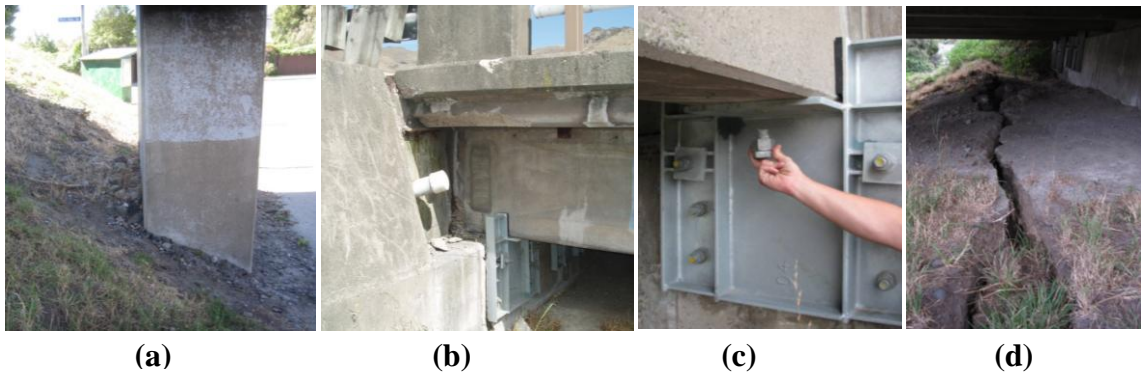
Damage at the abutments: a) Slope failure; b) Flexural cracking (c) Sheared bolt at the abutment retrofit; (d) Transversal crack at the top of the South-East slope
